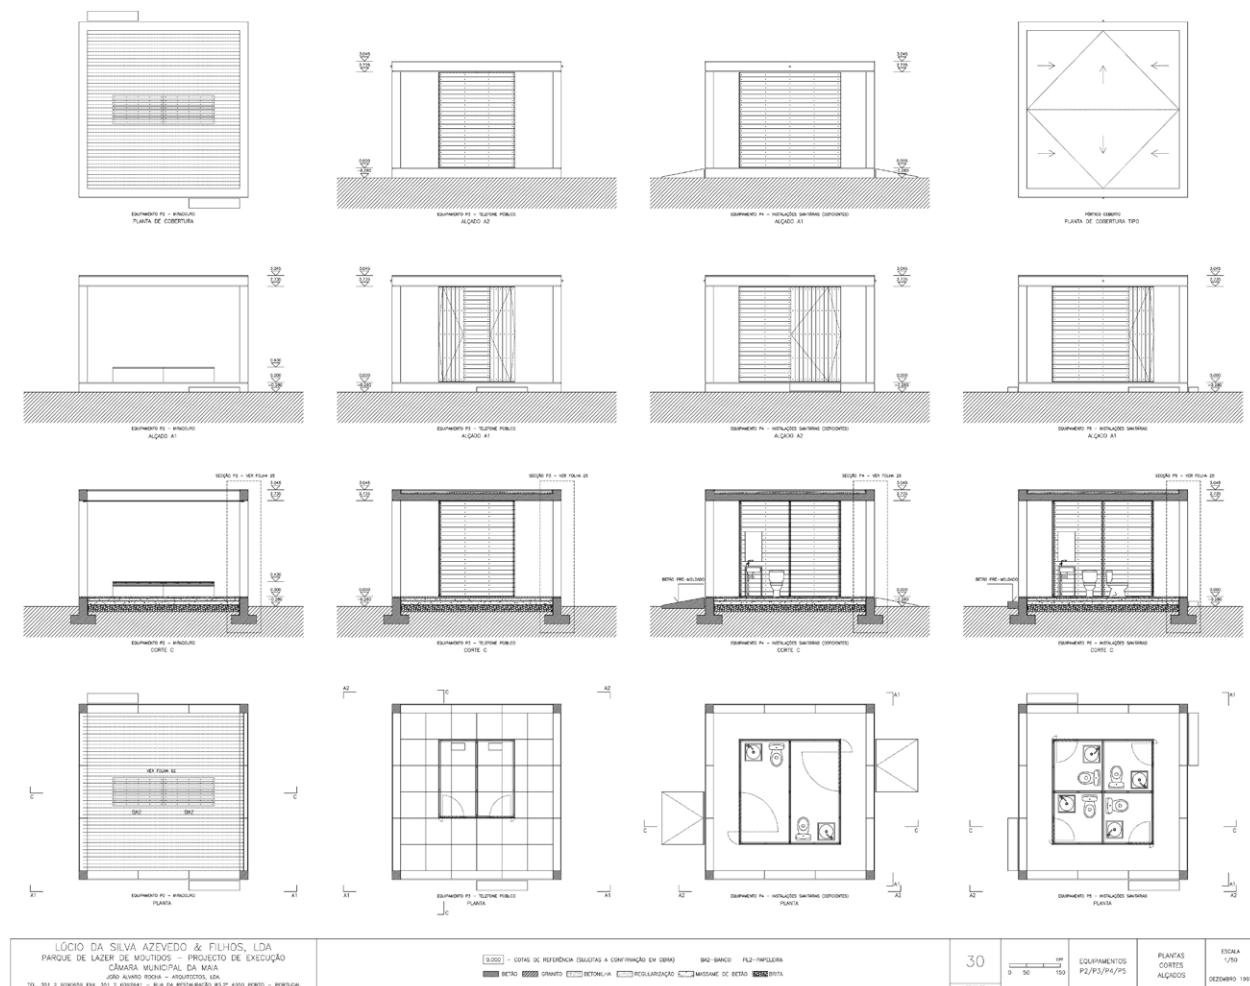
Architectural definition of various system elements: viewing platform, public telephone, accessible toilet, and bathroom. E. 1/50. (AutoCAD). Author: Rocha, J. A., 1998 (Source: Execution project, 2021).
